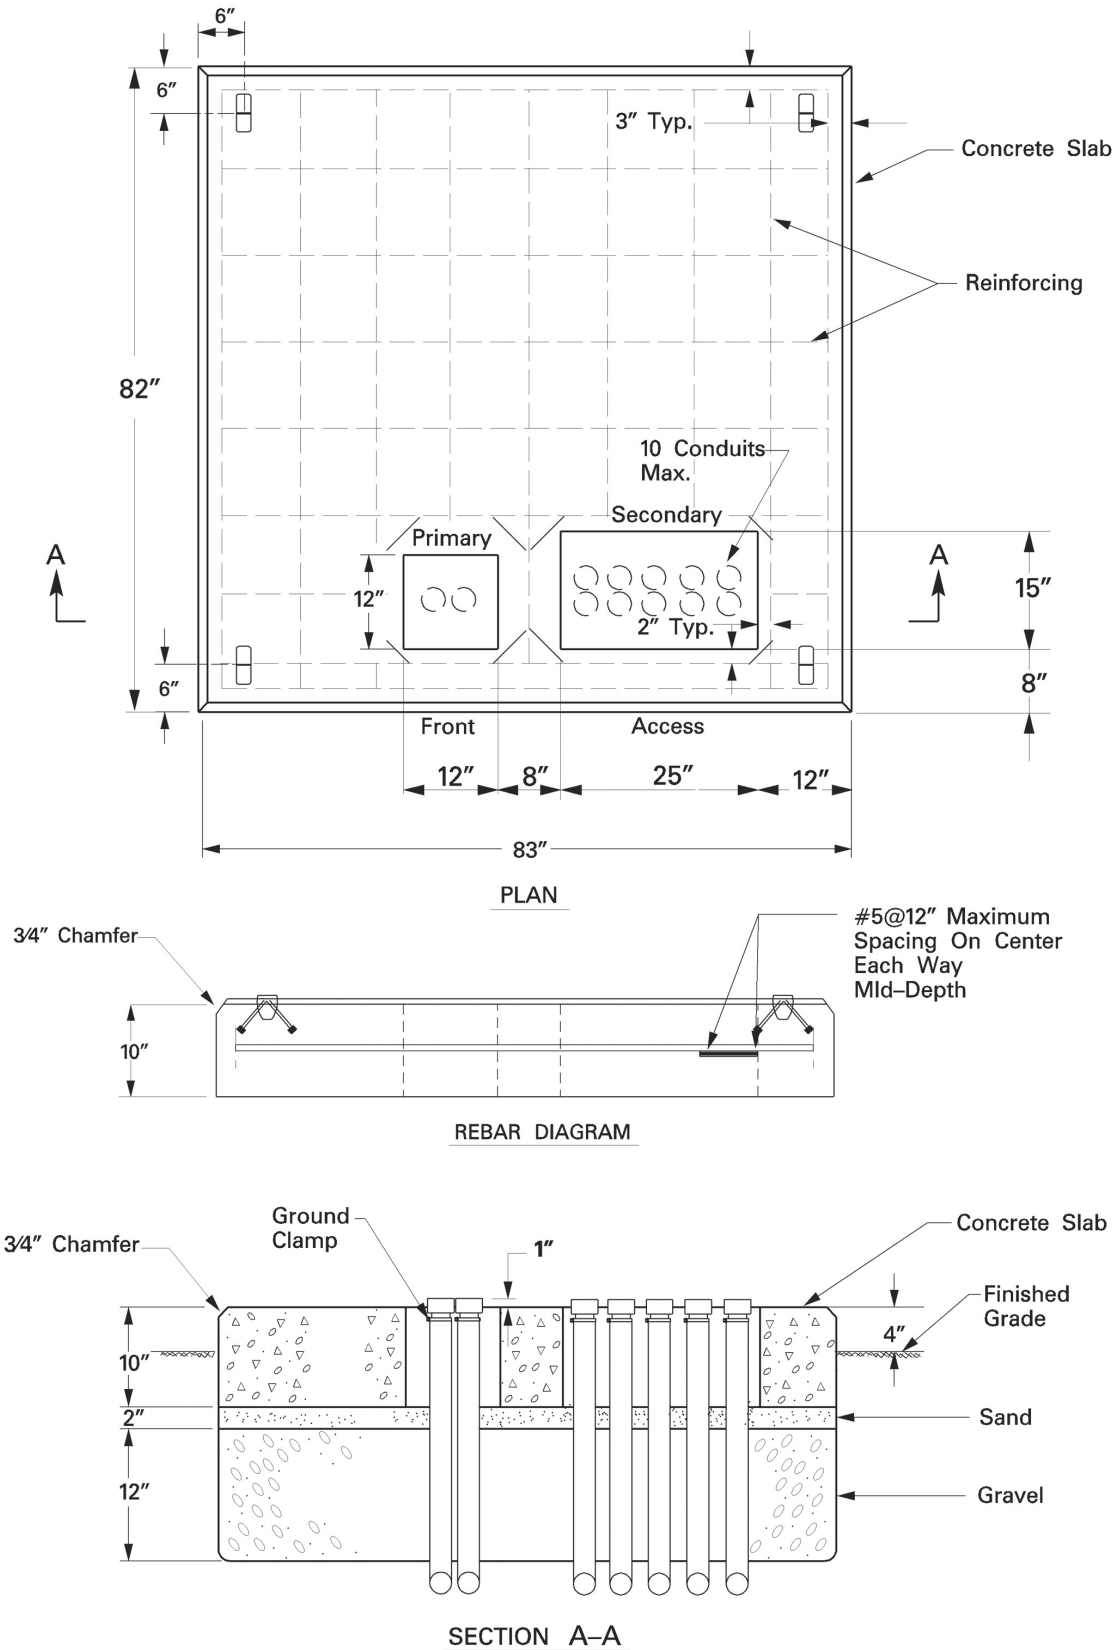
15kV Transformer Pad 75- 500kVA 44-113 (ref-44-113/UF8A)
